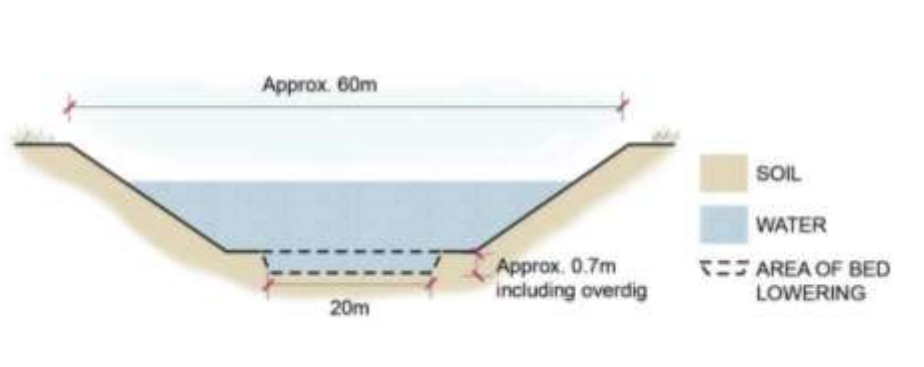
Cross-section of proposed bed lowering in the River Thames downstream of Desborough Cut (not to scale).
